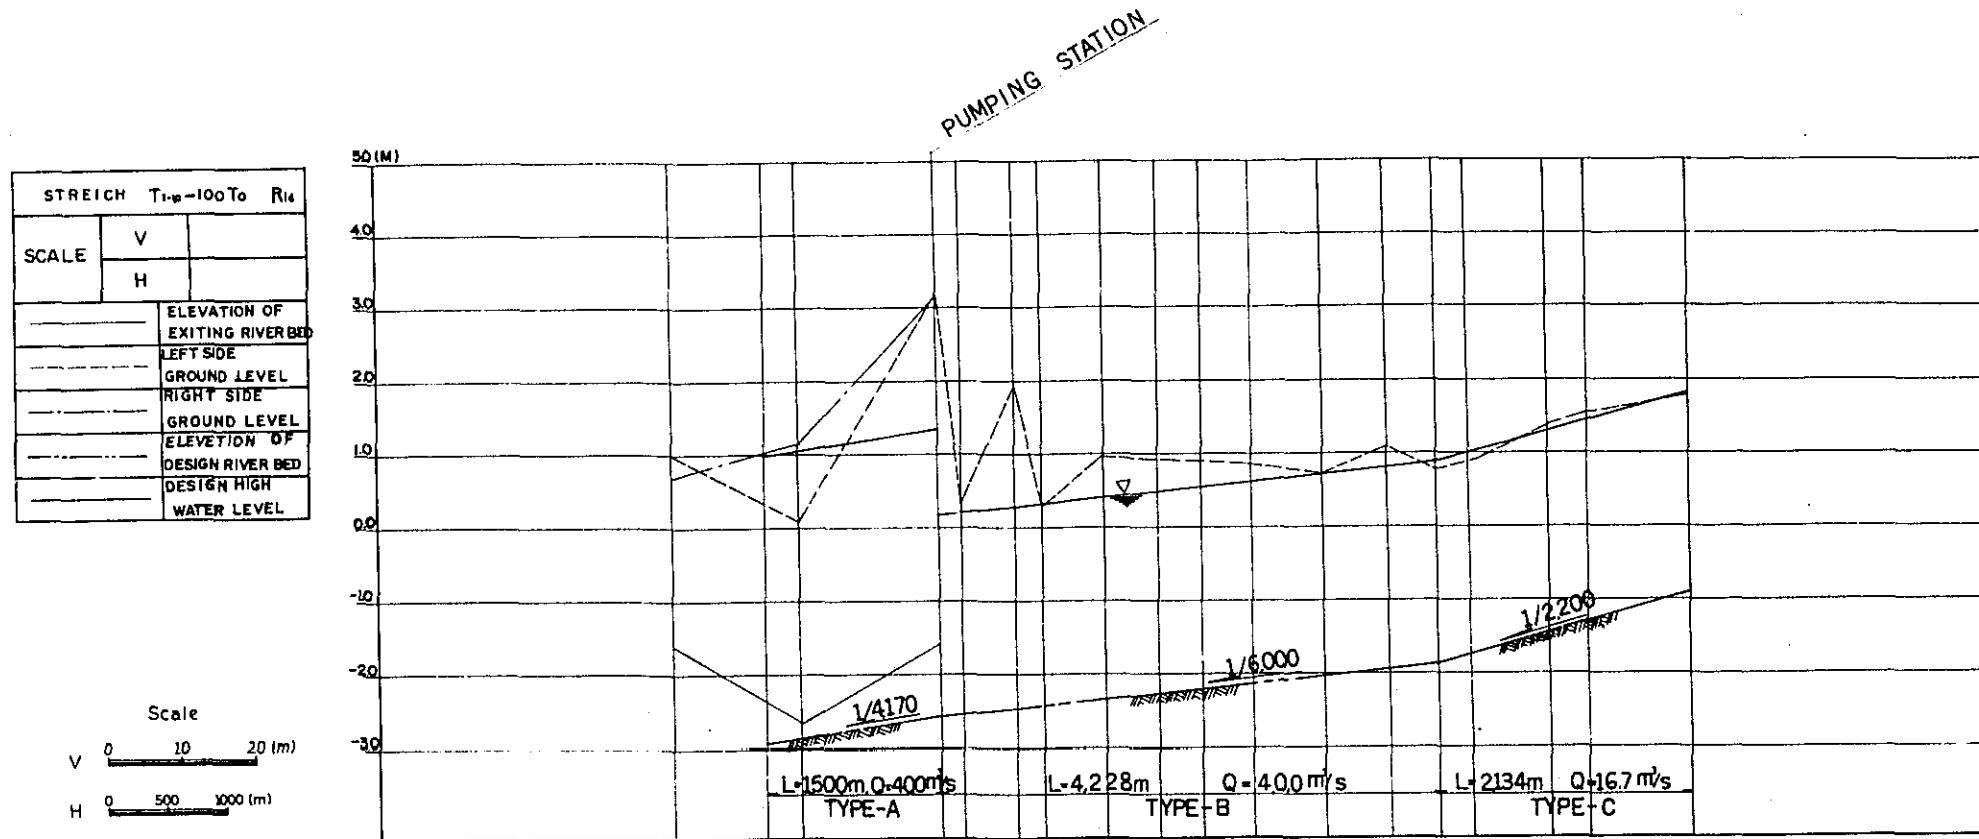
(1) LONGITUDINAL PROFILE OF DRAINAGE CHANNEL FOR OVERALL PLAN
